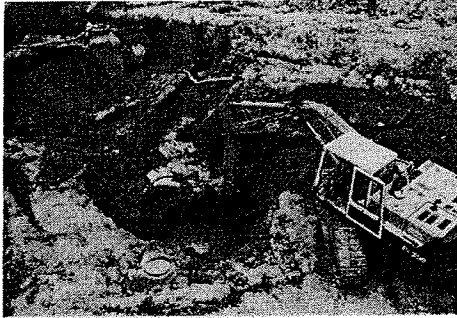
Offset of a Sewage Pipe at Point H (Point D, refer to Fig. 3)
